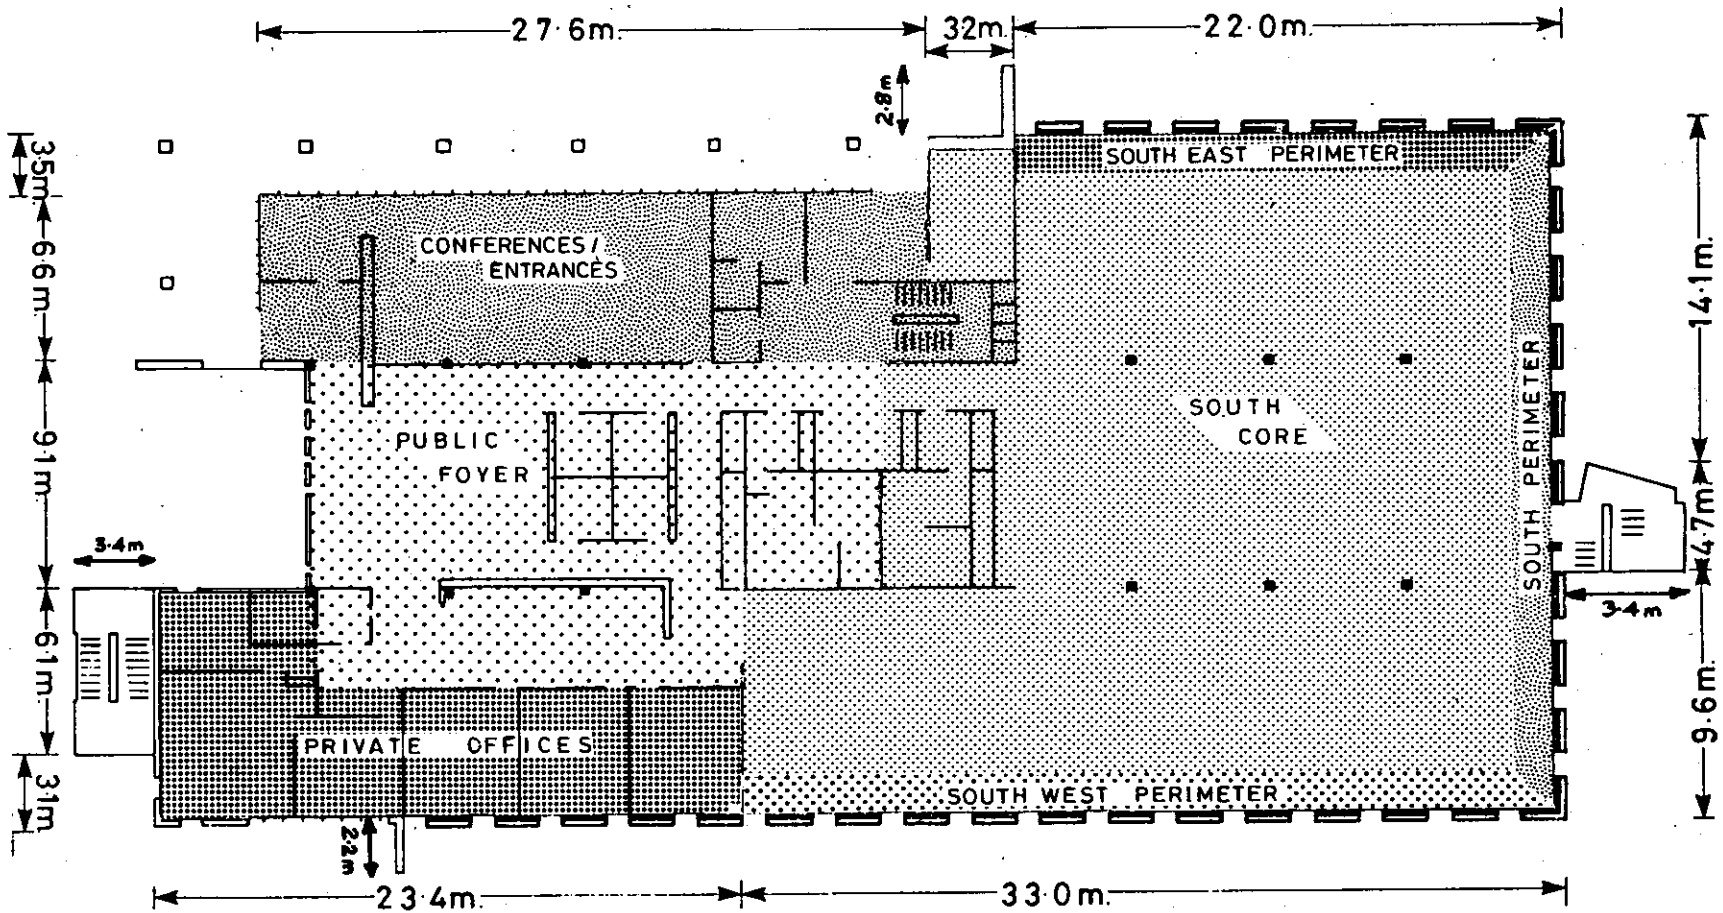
GROUND FLOOR PLAN - all perimeter zones 3m deep
